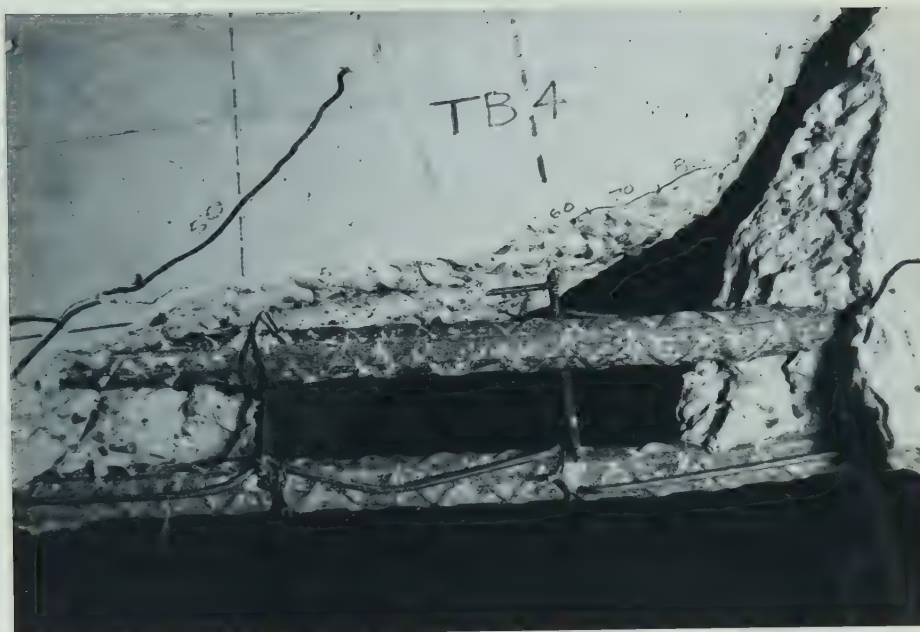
Damage to anchorage at bottom of failure crack in TB 4
